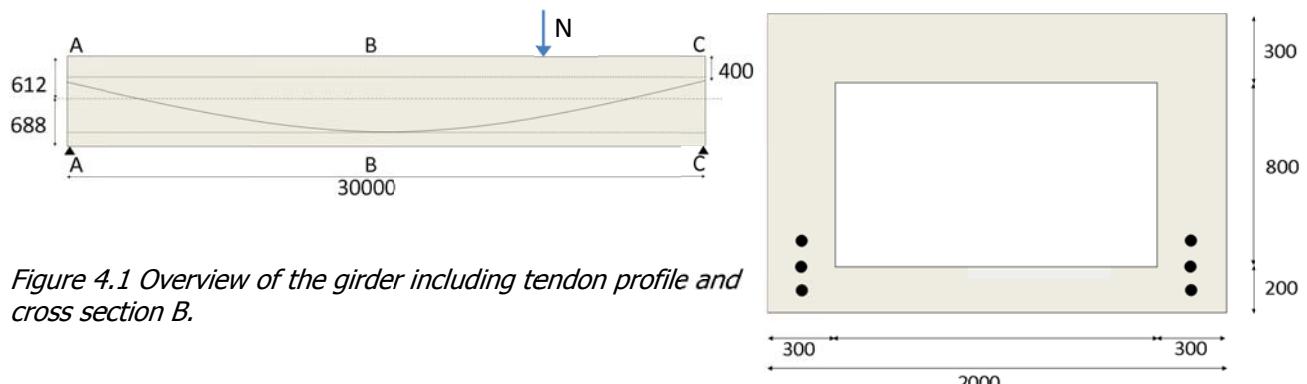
Overview of the girder including tendon profile and cross section B.
